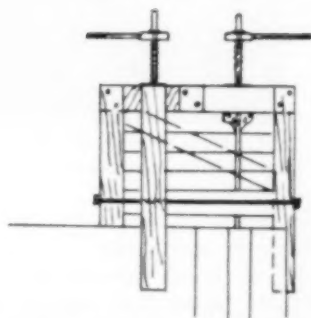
Cross-beams to Prevent "Dragging" at Corners.
